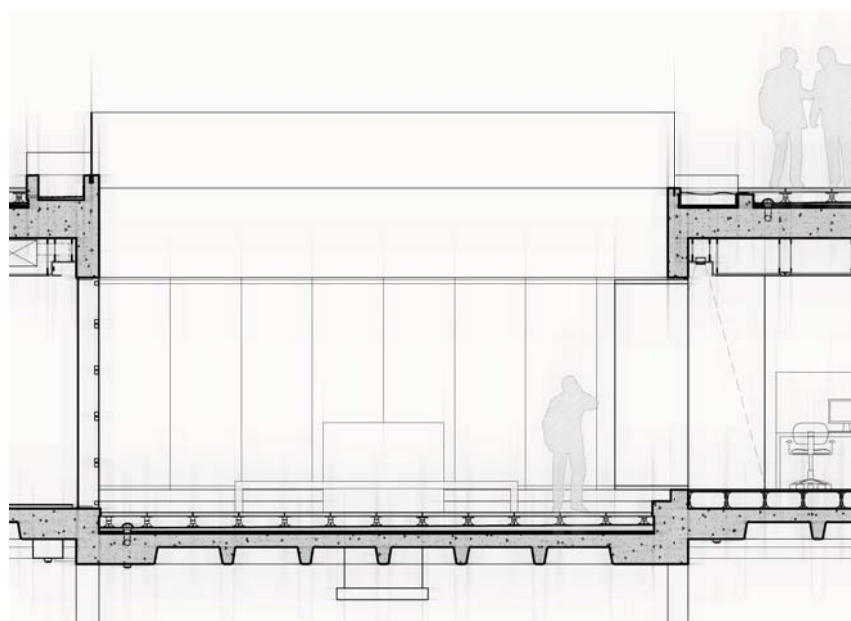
Courtyard construction and spatial relationship. Scale 1:100 (Author, 2011).
